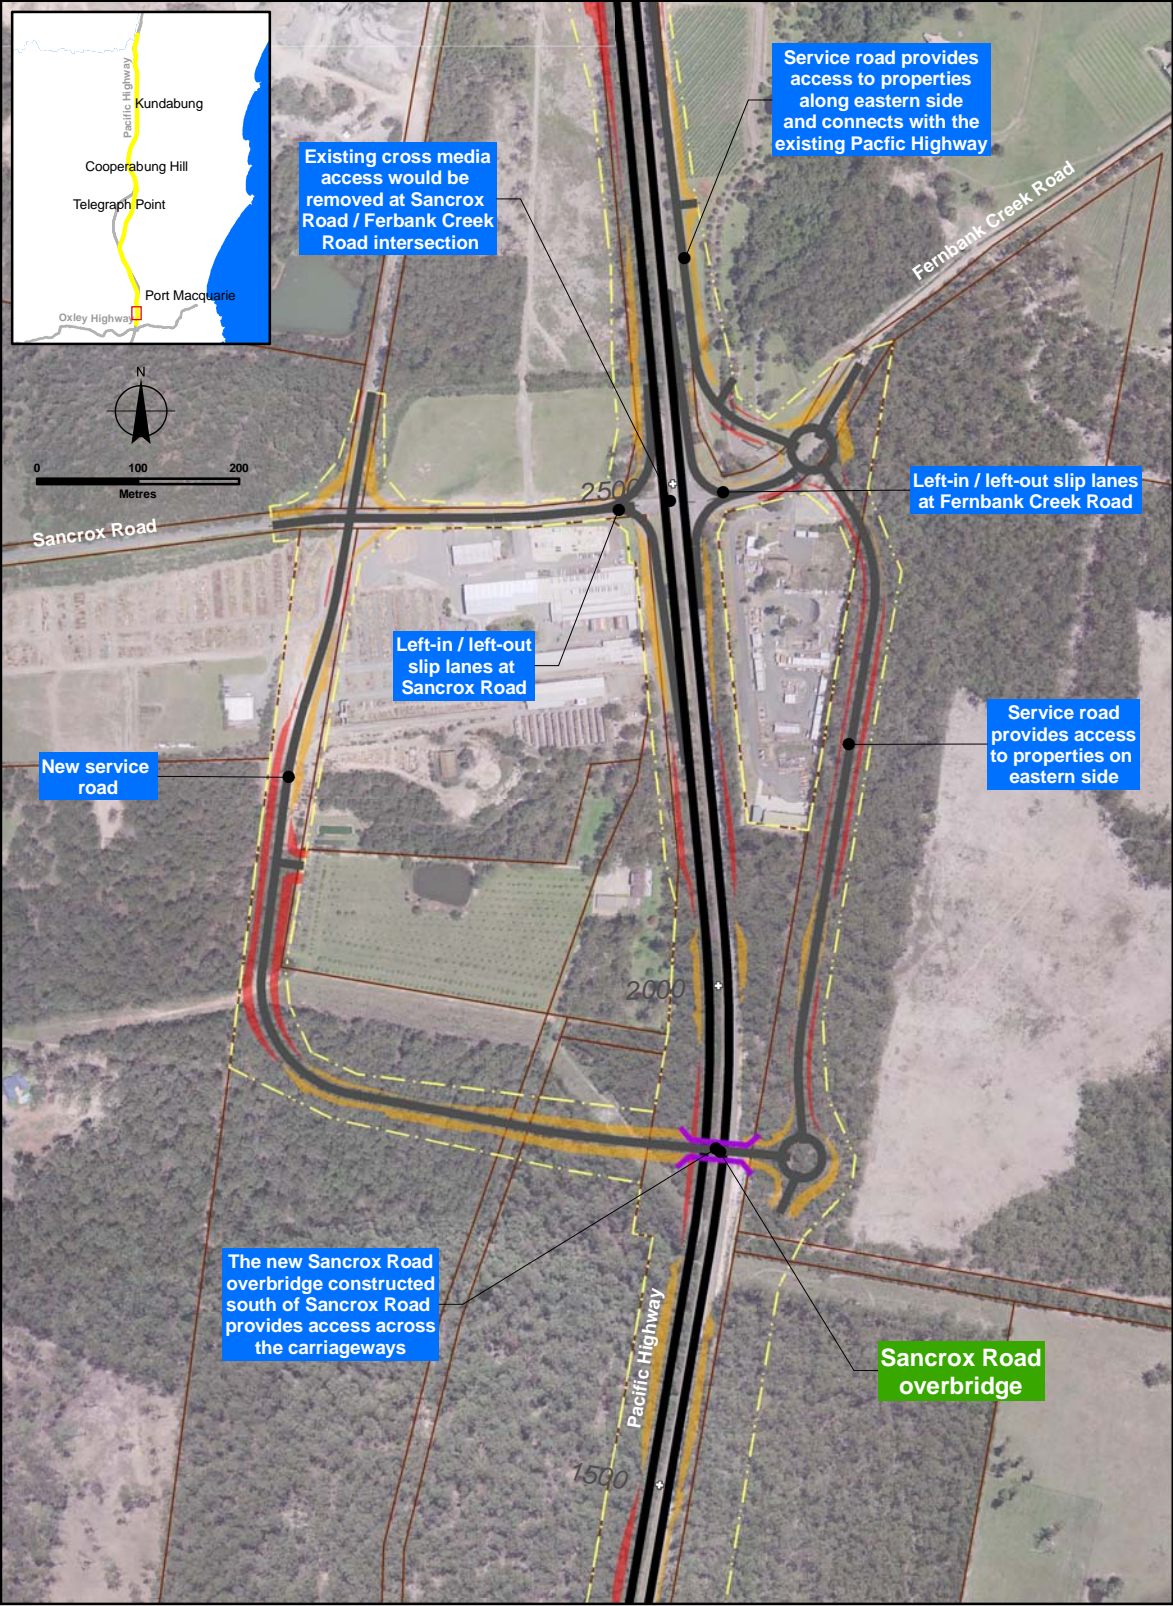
Sancrox Road and Fernbank Creek Road traffic arrangement
